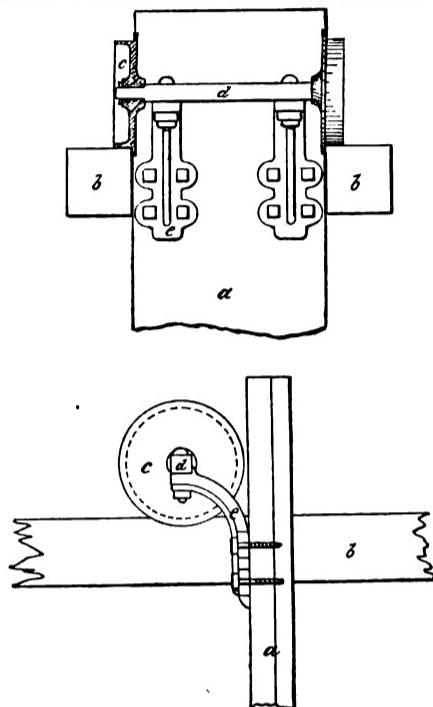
DETAIL OF MANNER OF HANGING HORSES IN DRYING-ROOM.
